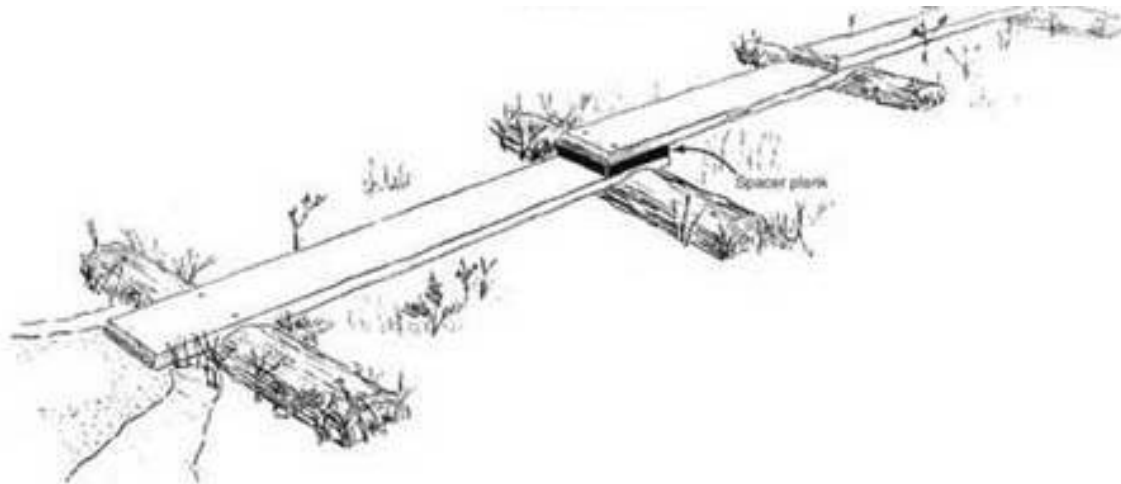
Bog Bridge: Step and Run Technique (USFS *Wetland Trail Design and Construction*)
